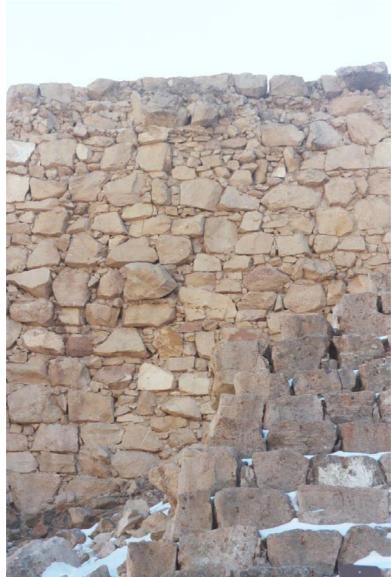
Exposed downstream face of upstream masonry wall. A small portion of downstream shell is evident in lower right of photo
